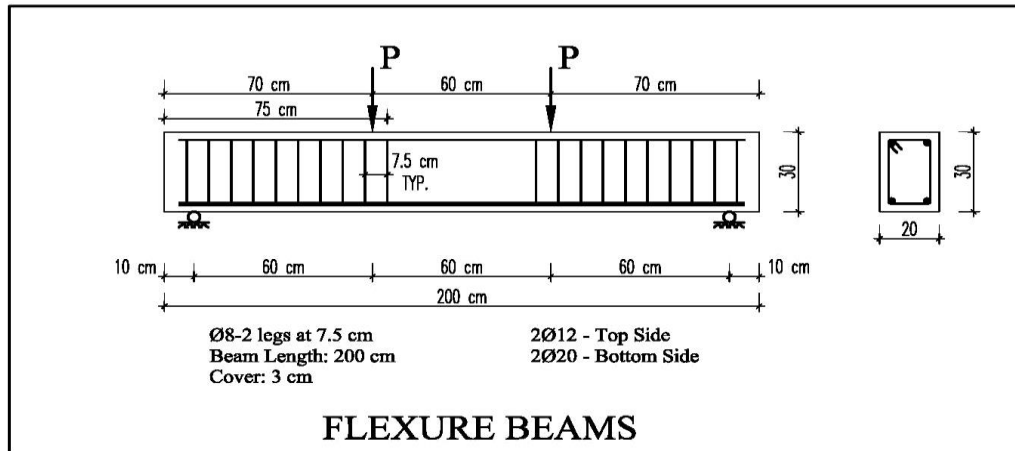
Structural detailing of the tested reinforced concrete beams
